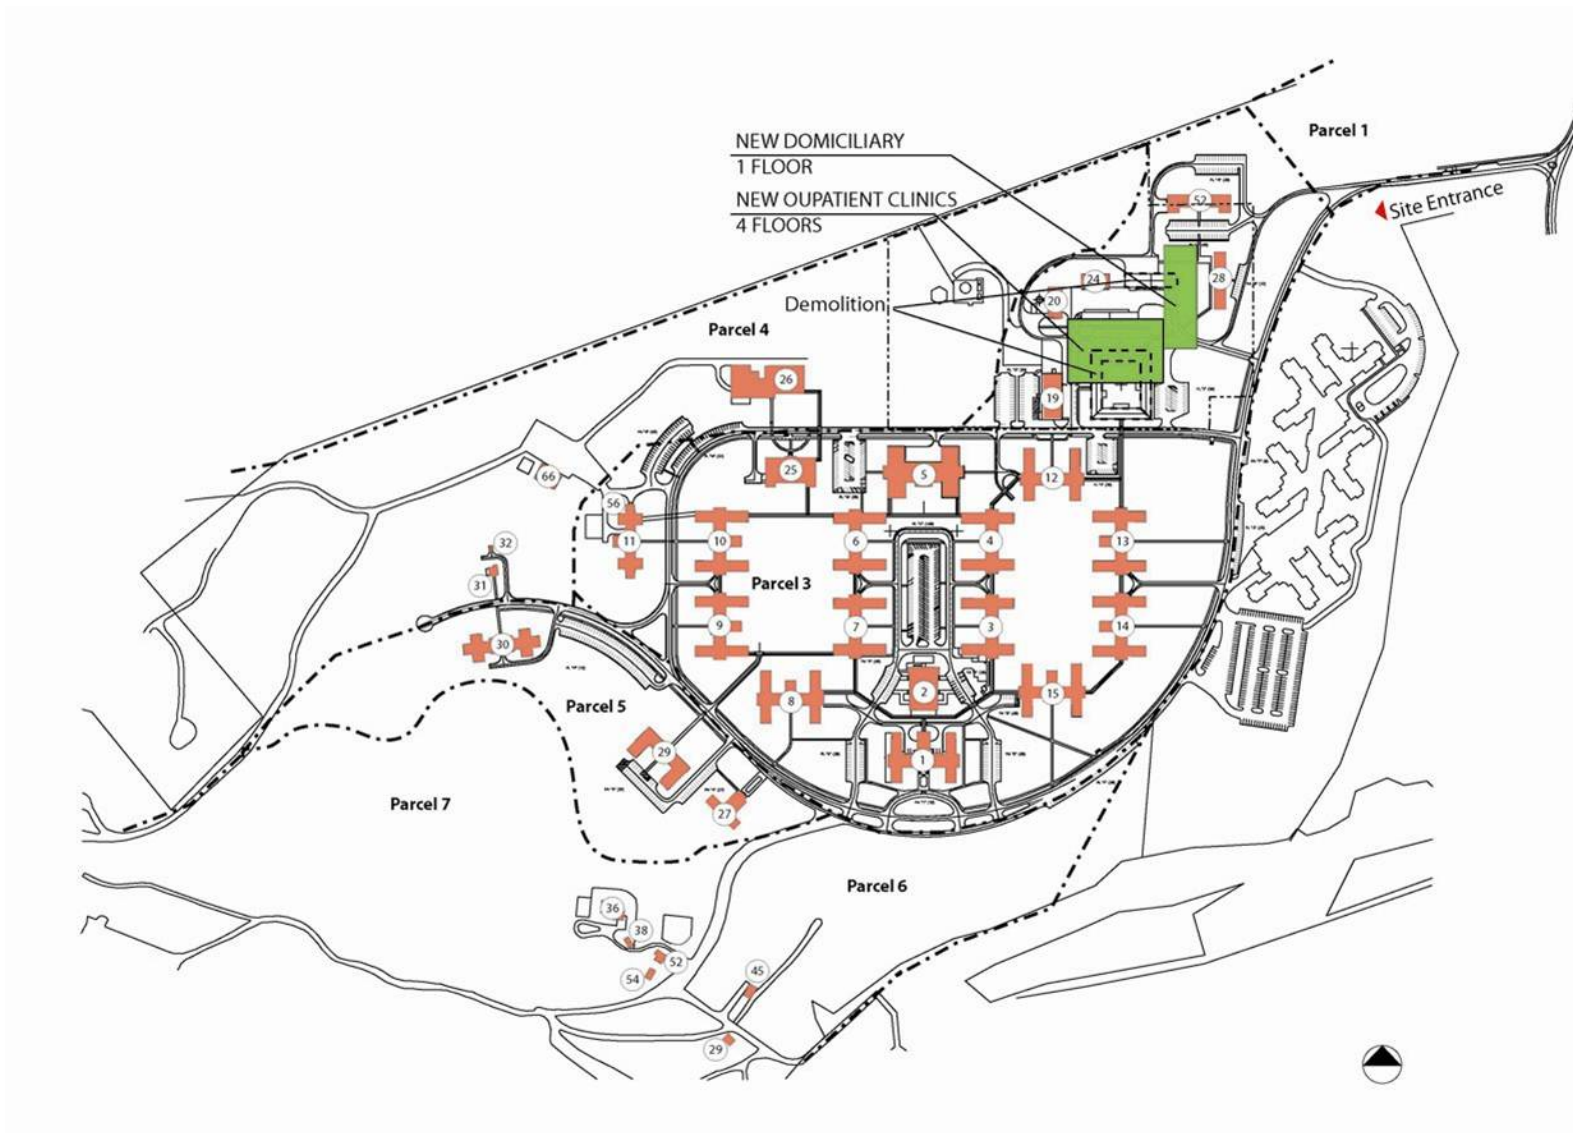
Proposed New Site Plan - BPO 4 (At Montrose, Construct New Domiciliary and Ambulatory Care Facility South of Fire Station (Site of Buildings 13 and 14))
